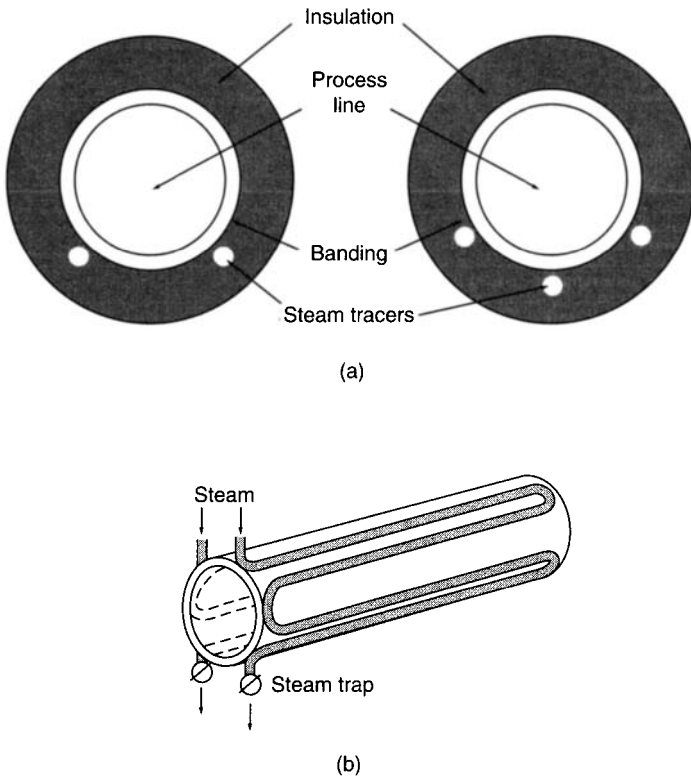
Typical installation of steam tracing lines for horizontal piping. (a) Single and multiple tracing; (b) multiple tracing.
